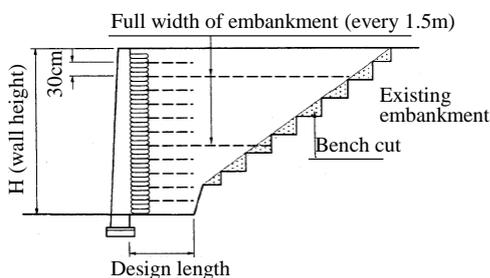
Arrangement when the embankment is widened under ordinary conditions
